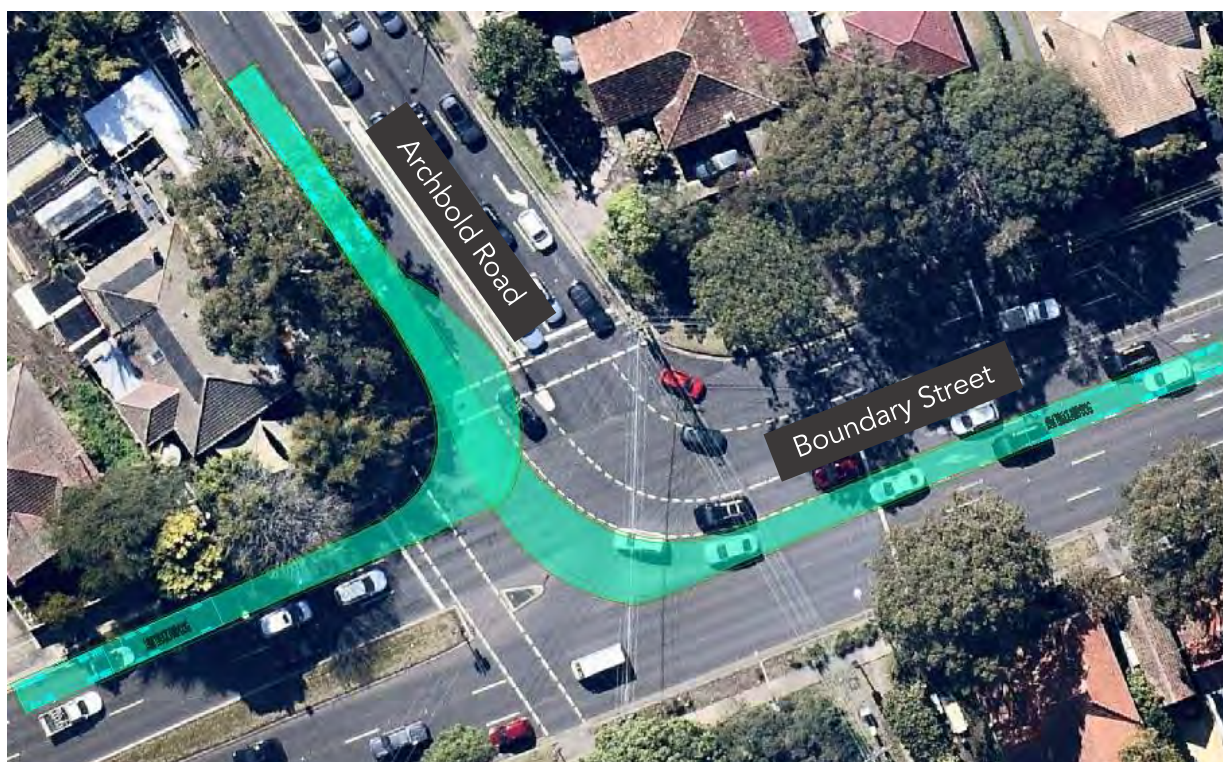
19m Truck and Dog at intersection 1 (Boundary Street/Archbold Road)
